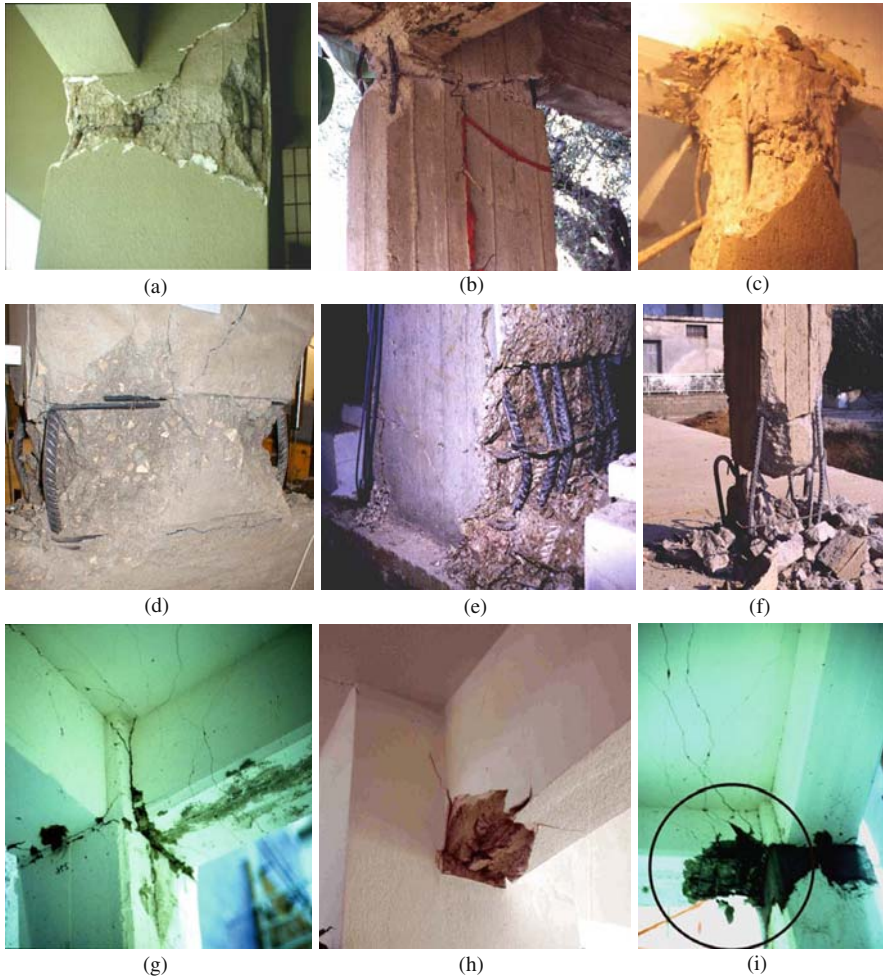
Examples of flexural damage or failure in the lab or in the field: (a), (b) horizontal crack at column top, concrete spalling at the corners, buckling of corner bars; (c) complete loss of cover, partial disintegration of concrete and buckling of bars in horizontal zone near the column top; (d) full loss of cover, partial disintegration of concrete and buckling of bars in horizontal zone just above column base; (e) loss of cover, partial disintegration of concrete core and bar buckling, with tie opening-up on one side of a column above the base; (f) full disintegration of concrete and buckling of bars in a lapping region at floor level; (g) through-depth cracking near the support of a T-beam with extension of the cracks into the slab at the top flange; (h) local crushing of concrete and bar buckling at the bottom of a T-beam; (i) disintegration of concrete and bar buckling at the bottom of a T-beam, with through-depth flexural cracks extending into the slab at the top flange (See also Colour Plate 7 on page 721)
